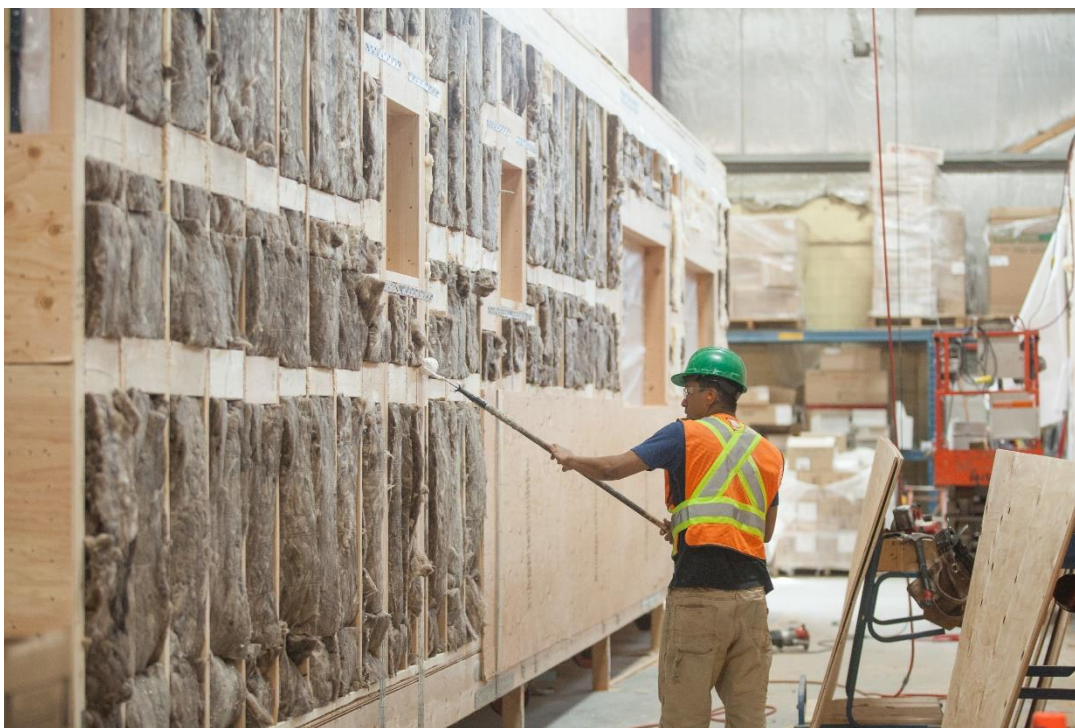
Controlled construction environment at manufacturing plant (Image source: Metric Modular)
